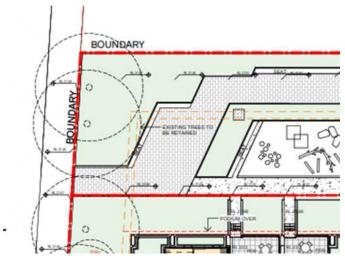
Revised western entry into Open Space 2 area (noting that a condition is imposed to retain the existing path adjacent to Lot G boundary that will provide a second entry / exit point to Banks Ave)
